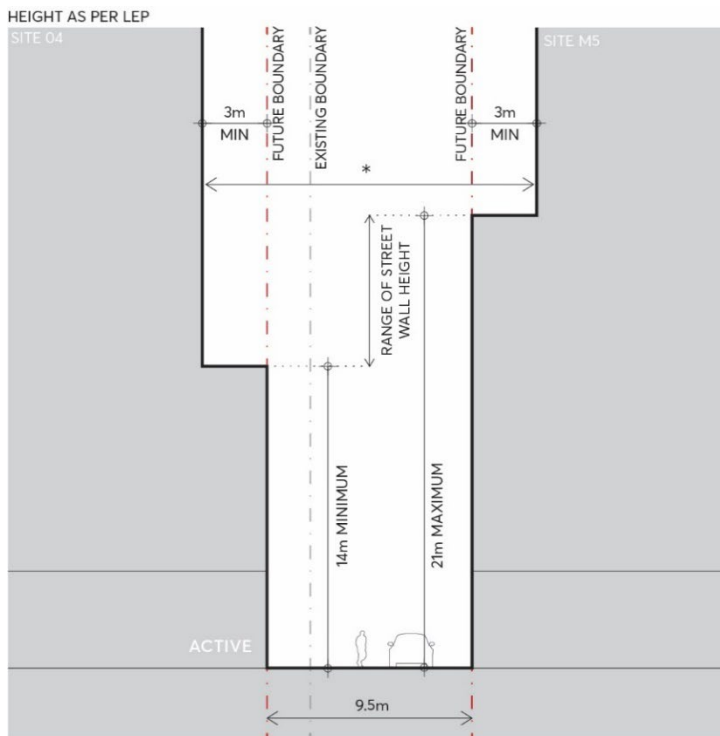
Future Horwood Place (Section C) Setbacks & Street Wall Height
